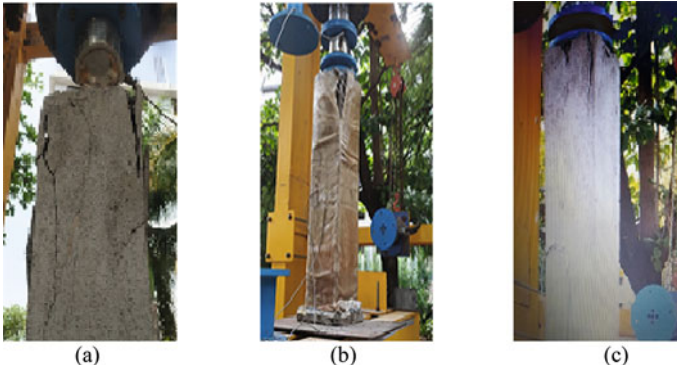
Failure patterns: a unconfined brick masonry column, b GFRP confined brick masonry column and c chicken mesh confined brick masonry column
